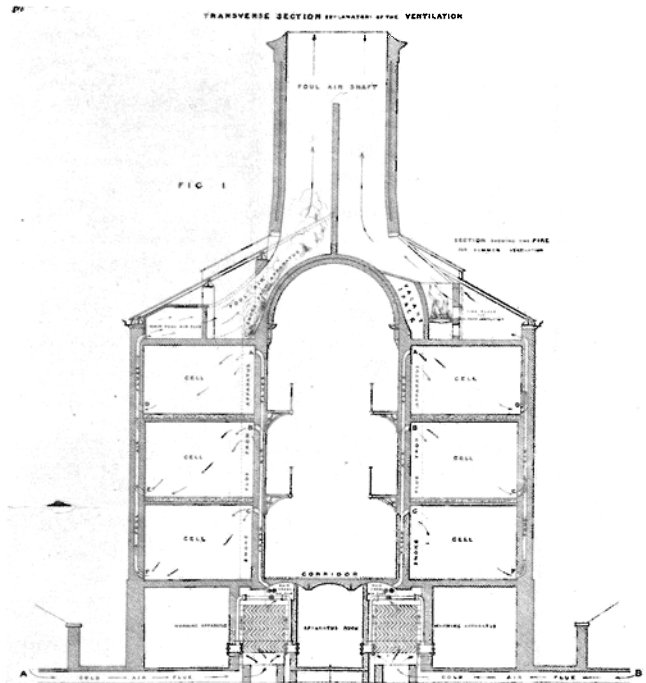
London, Pentonville Prison, erected 1841-1842, chief designer Joshua Jebb, section showing hot air heating and heat-aided extraction ventilation system (*Report of the Surveyor General of Prisons on the Construction, Ventilation and Details of Pentonville Prison*, London, 1844)
